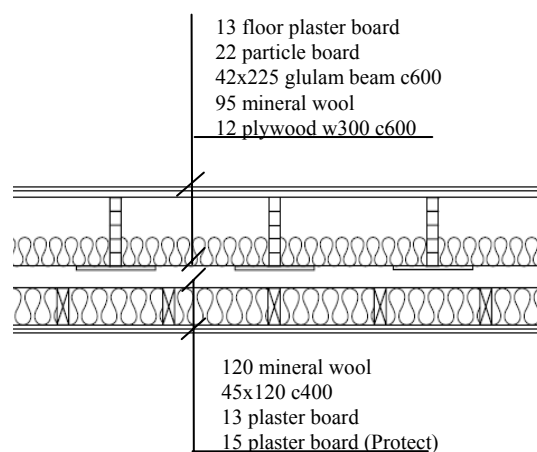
Separated floor (upper) and ceiling (lower) sections.
